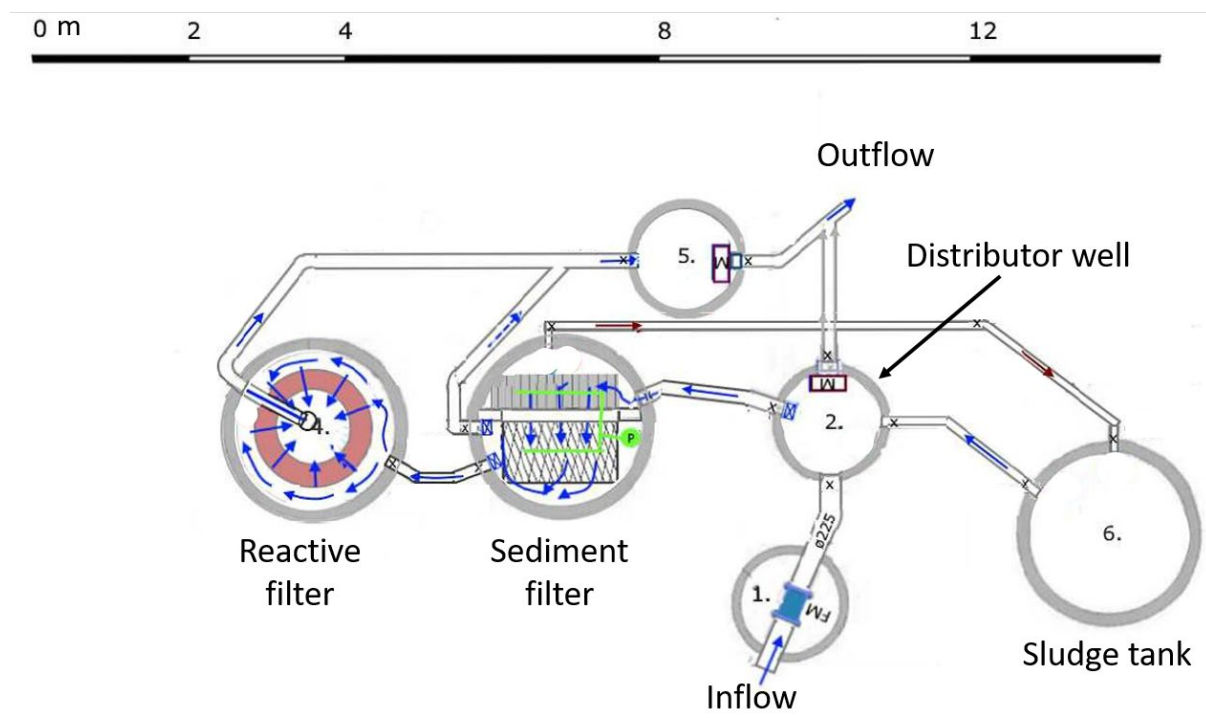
Schematic drawing of the drainage P-filter system consisting of six cylindrical concrete wells.
